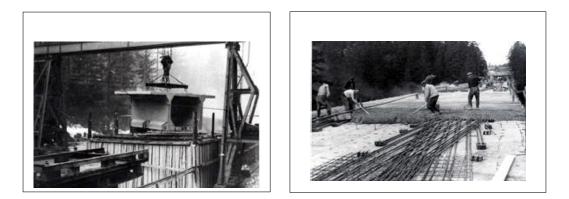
Sliding of span girder section (Latvian Road museum, n.d.)
